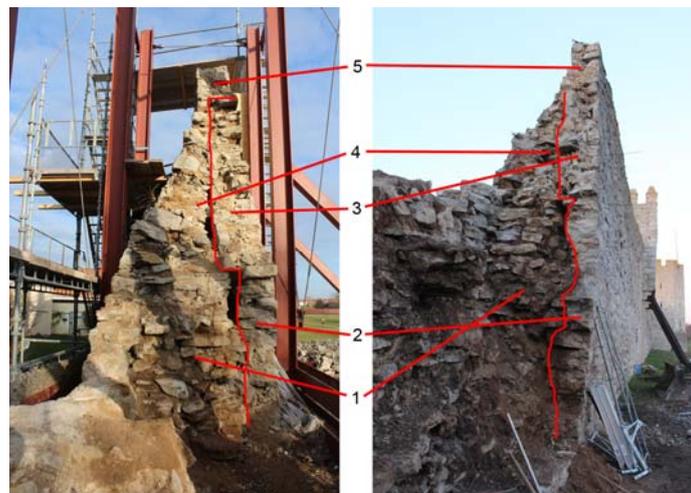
Two photos showing the same part of the wall at two different stages of dismantling of the collapsed part. 1) Lower core with clay mortar and no bond. 2) Thin outer masonry leaf. 3) Former parapet, now outer leaf of the middle part of the wall. 4) Upper core inside the parapet wall. 5) Top with solid masonry.
